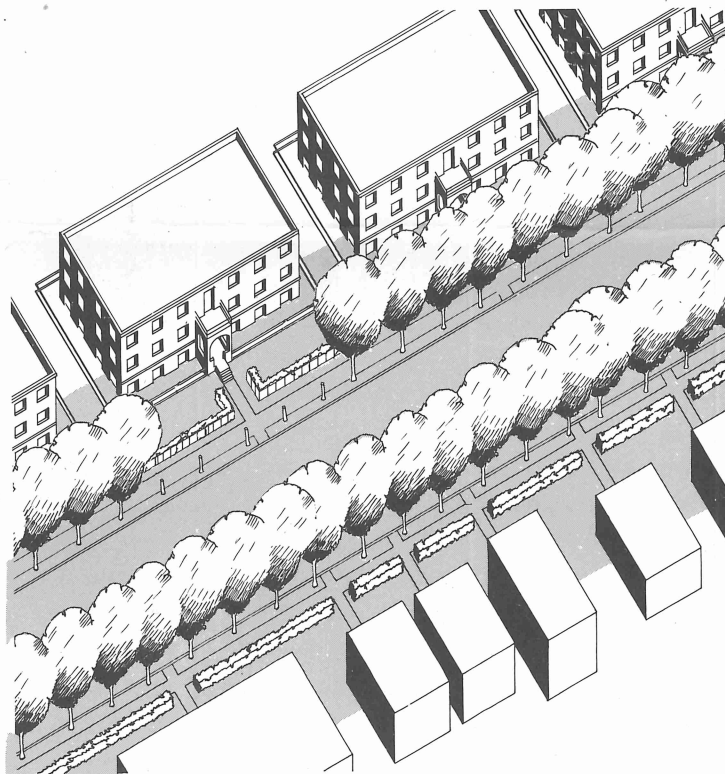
New and renovated housing orient toward a residential boulevard with front yards, wide sidewalks, lighting and shade trees.
